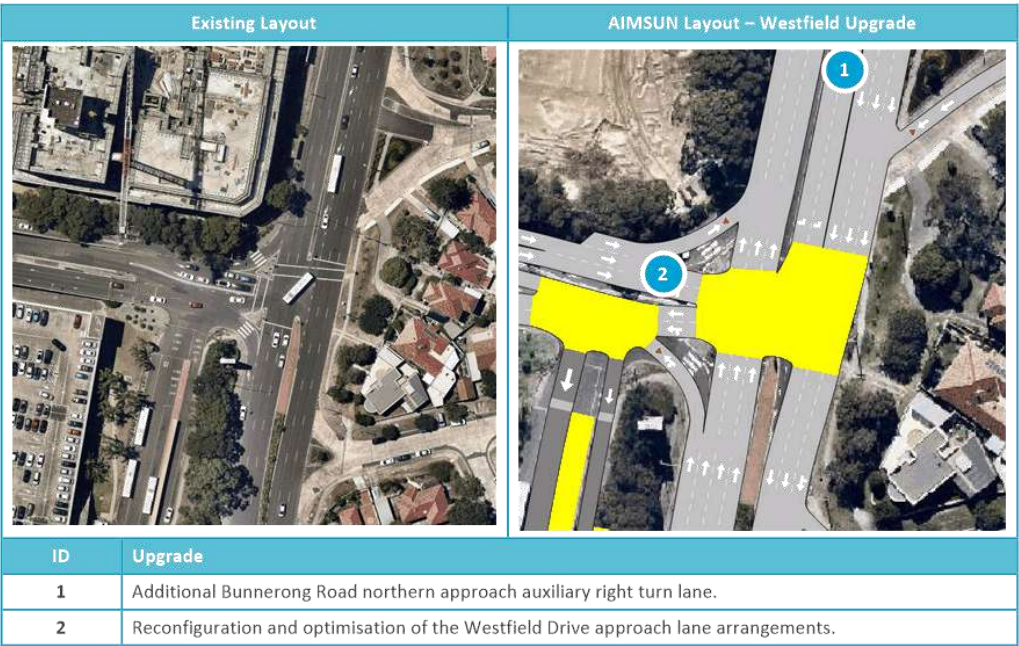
Existing and Proposed Layout: Wentworth Avenue/Bunnerong Road Intersection
